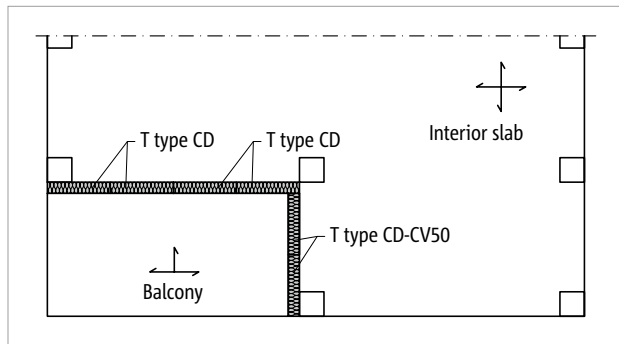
Schöck Isokorb® T Type CD: Two-way spanning
